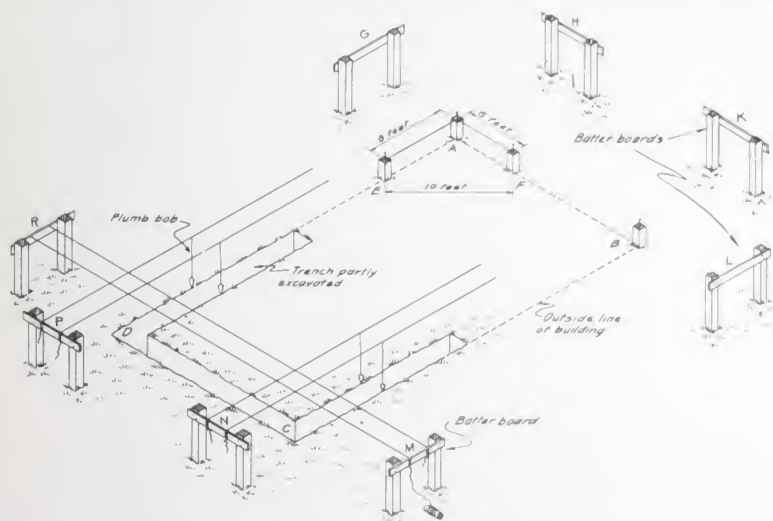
An illustration of the method commonly used to lay out foundation lines and to square building corners.
